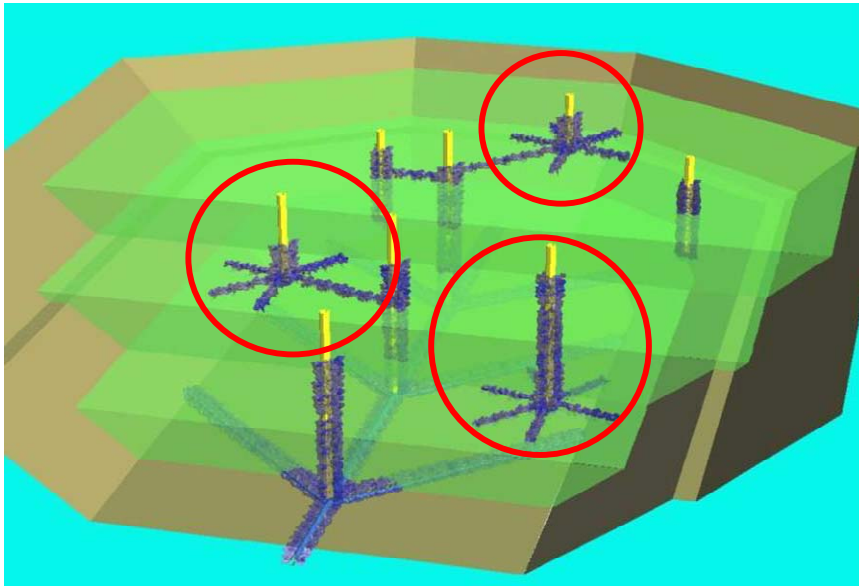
Installation of Additional Gas Venting Facility in Deep Waste Layer
